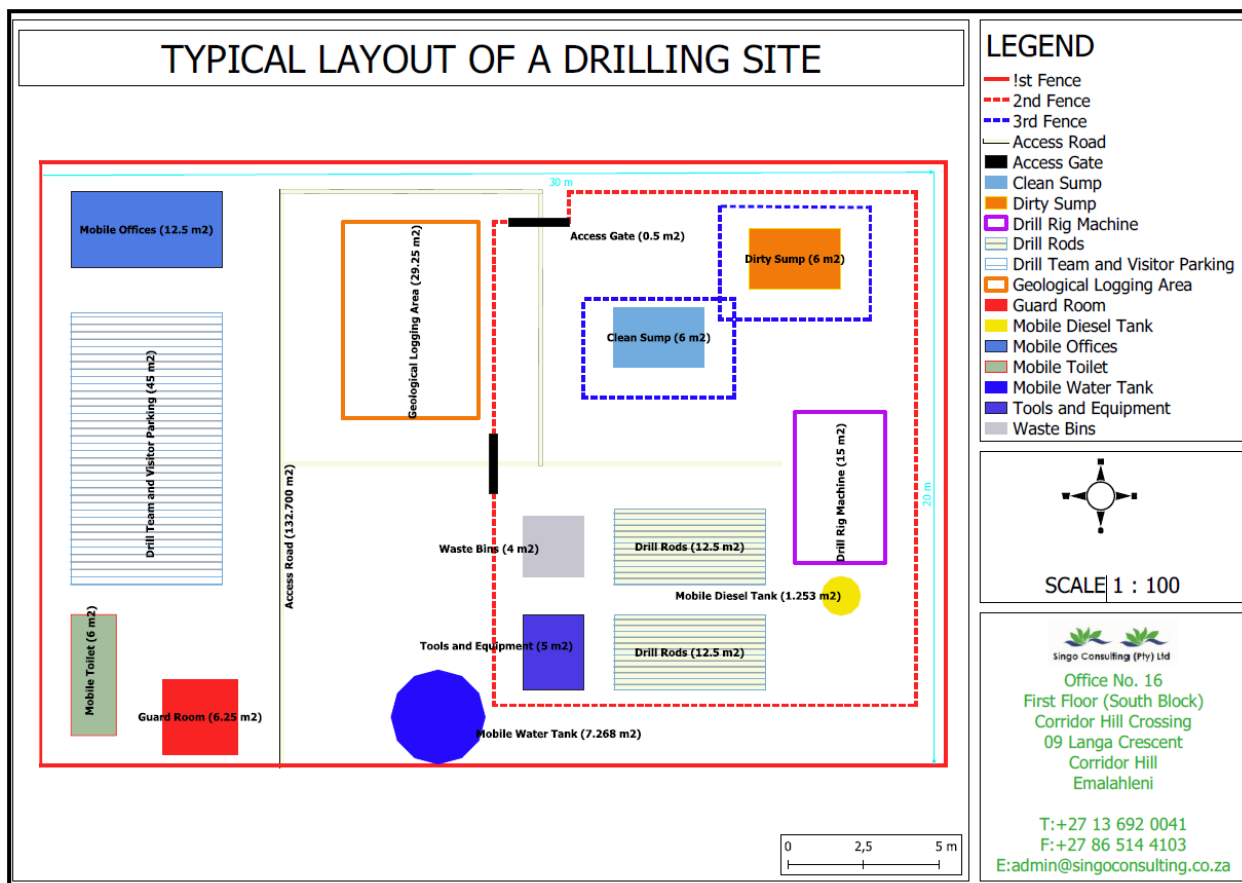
The drill site layout plan showing areas where specific activities will take place in the project area.
